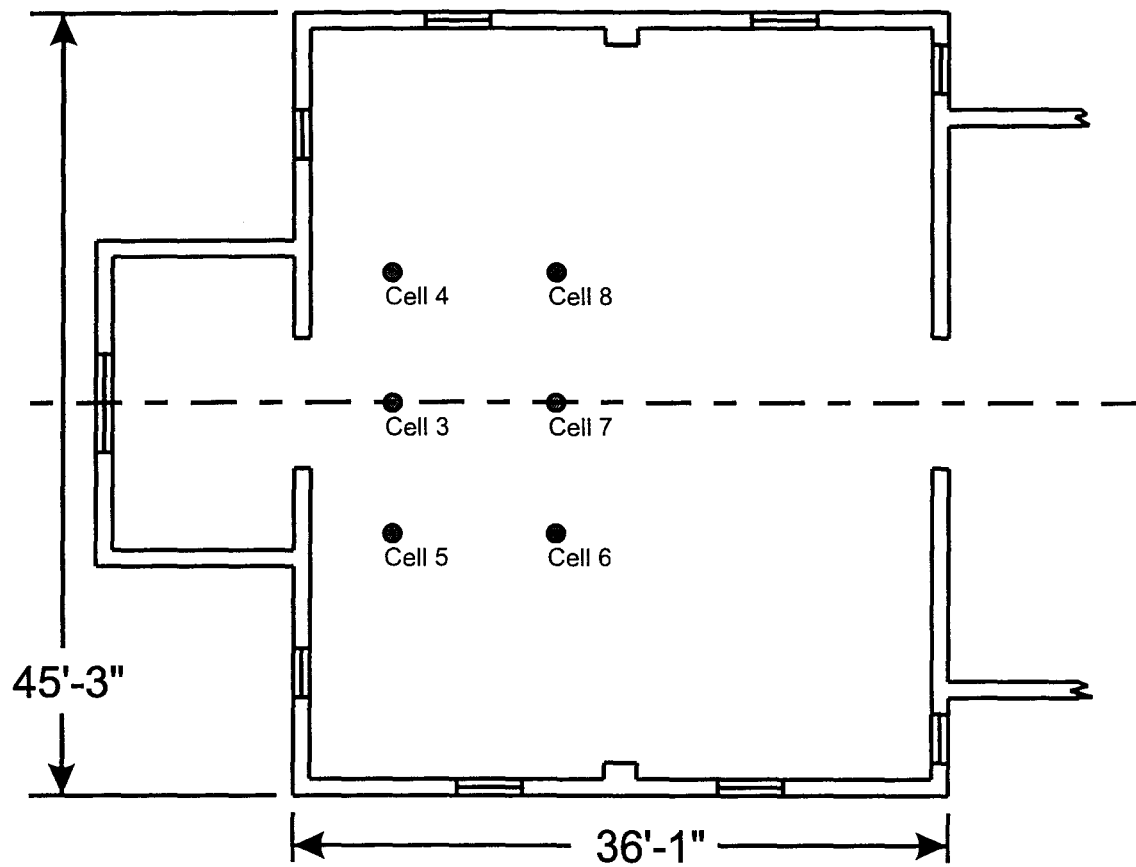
Floor plan of Pomeroy Hall and loadcell locations.
